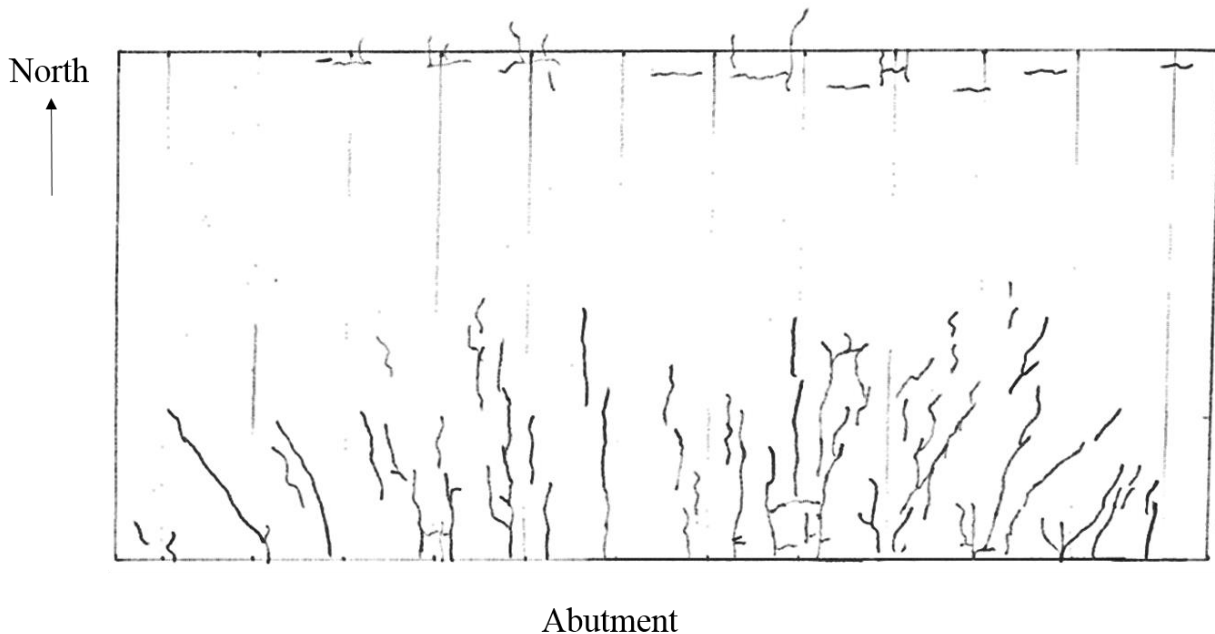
Crack map on the top of the deck on the south end of Bridge #605220
